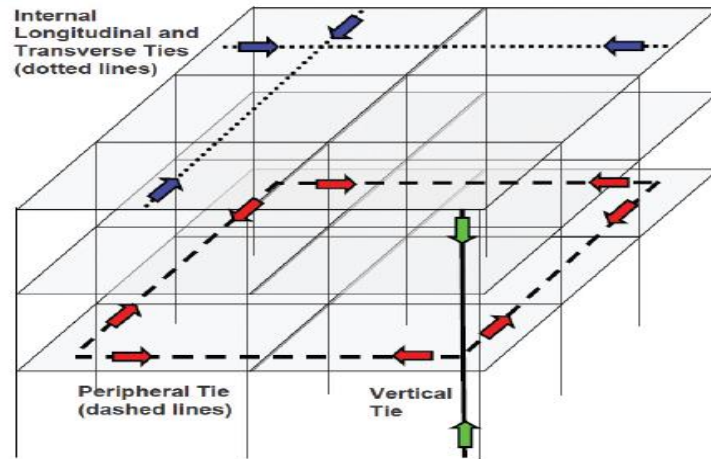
Tie force of a typical frame structure (DoD 2009)
